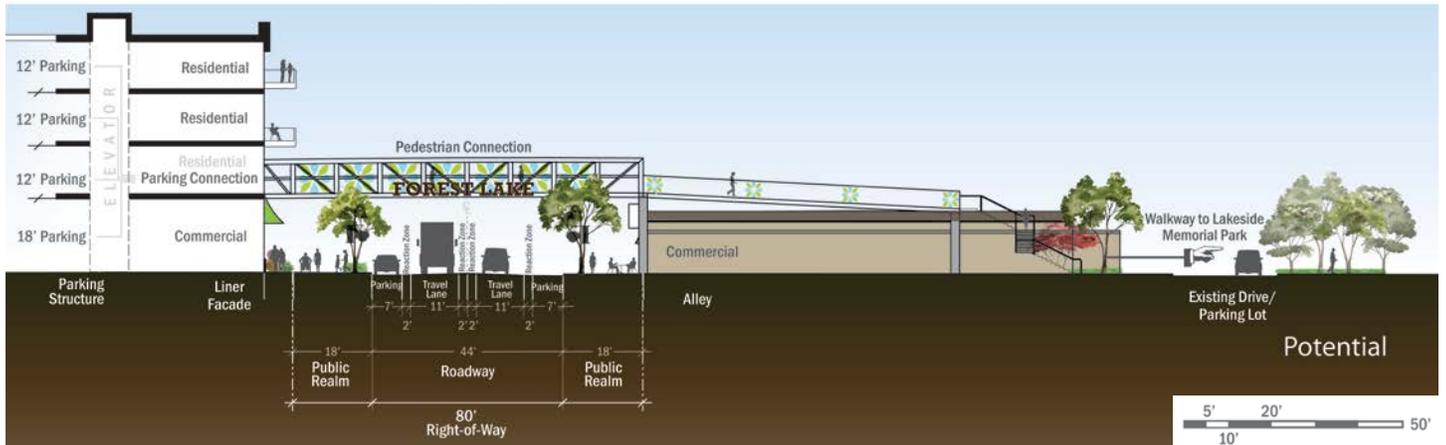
DISTRICT PARKING SECTION, OPTION 1 (SHOWING IMPROVED LAKE STREET STREETScape)
